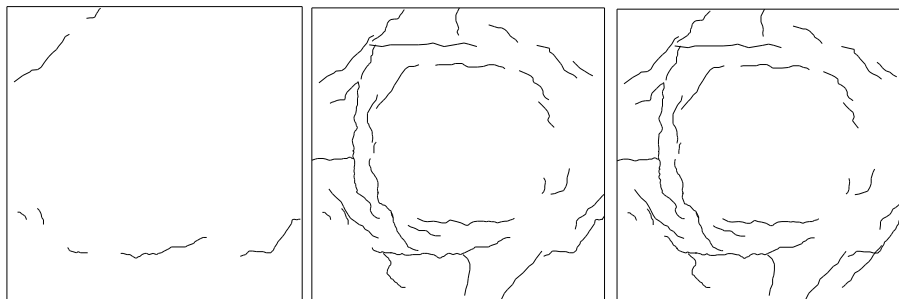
Crack patterns at the top side of specimen SY100f05-b after 1st, 2nd and 3rd impacts
